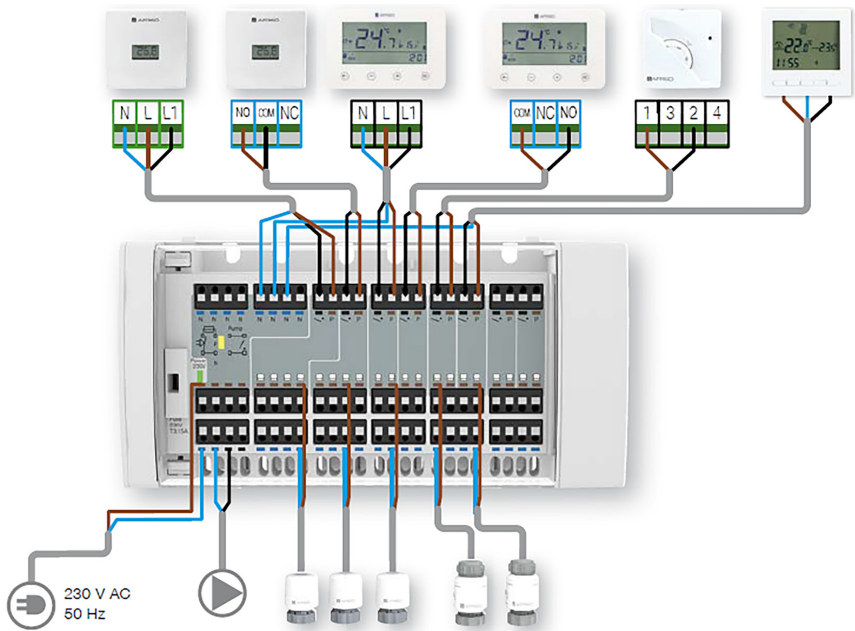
Controller terminal bar with room thermostats, pump and thermostatic actuators
